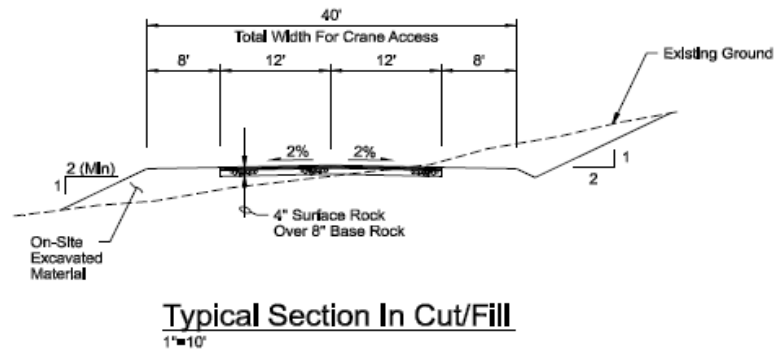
Typical Cross-Section for Site Access Roads in Cut and Fill
